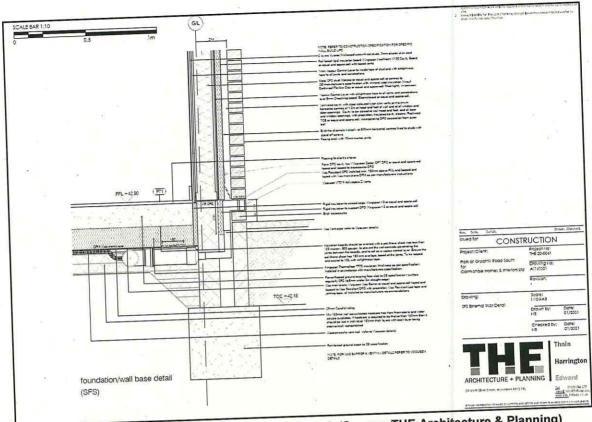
Typical section through facing brickwork (Source: THE Architecture & Planning)
